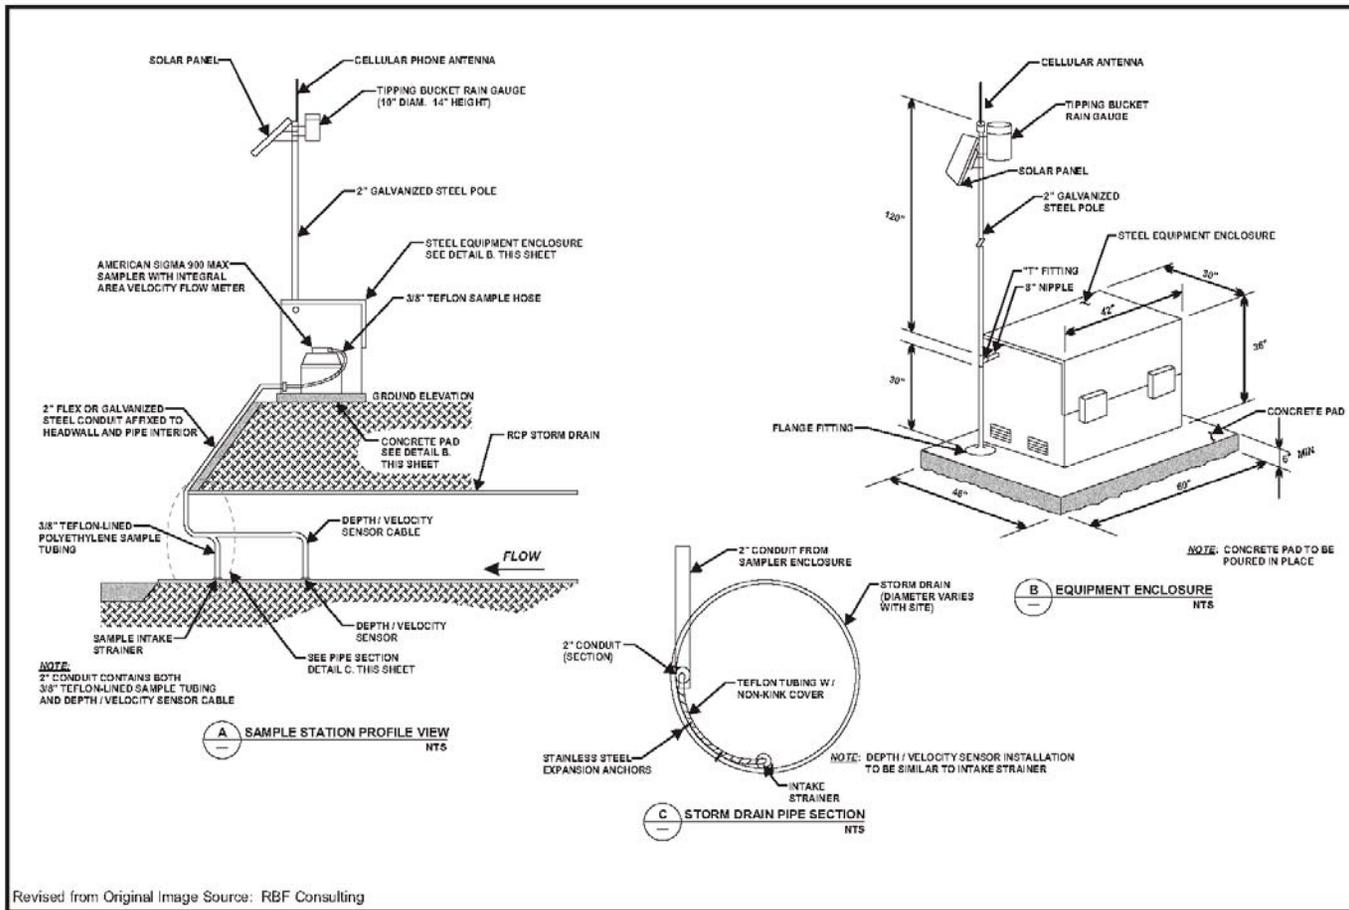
Typical KCLASS Stormwater Monitoring Station.
